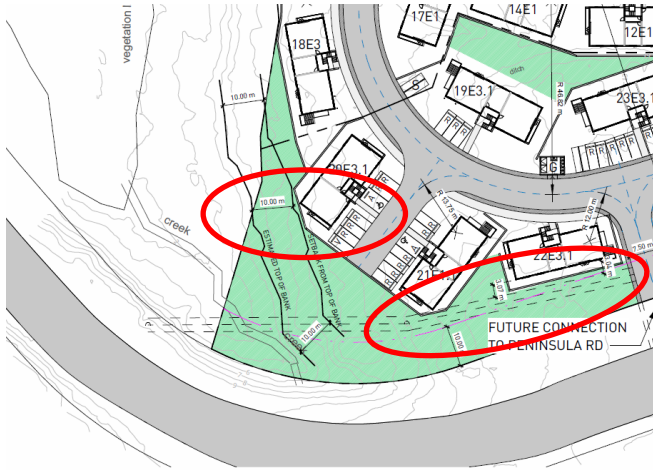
Architectural drawing A201. Retaining wall footings within setback from fish-bearing stream? Also, building setback from overhead hydro lines?
